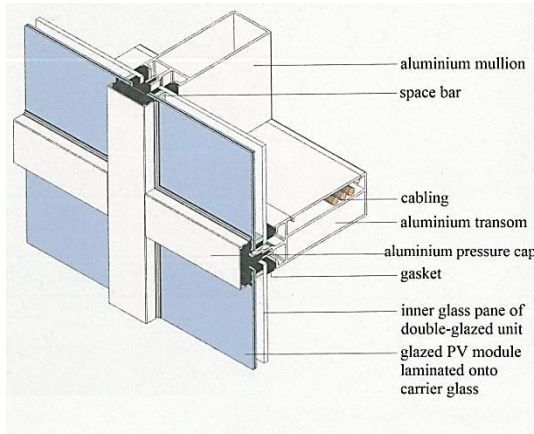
Detail of PV module and connections in a stick system curtain wall. The PV modules are laminated onto a carrier glass (Robert and Guariento, 2009).
